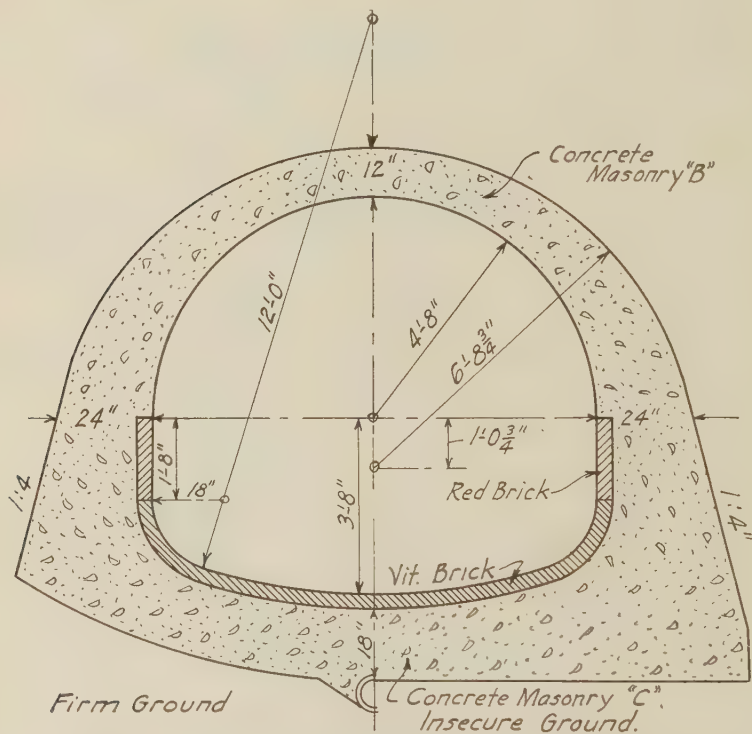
TYPICAL BASKET-HANDLE SECTION, WASHINGTON.
